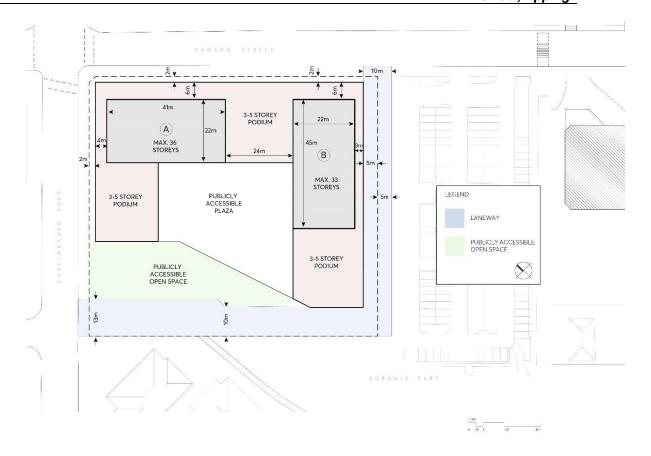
Indicative site layout and built form
